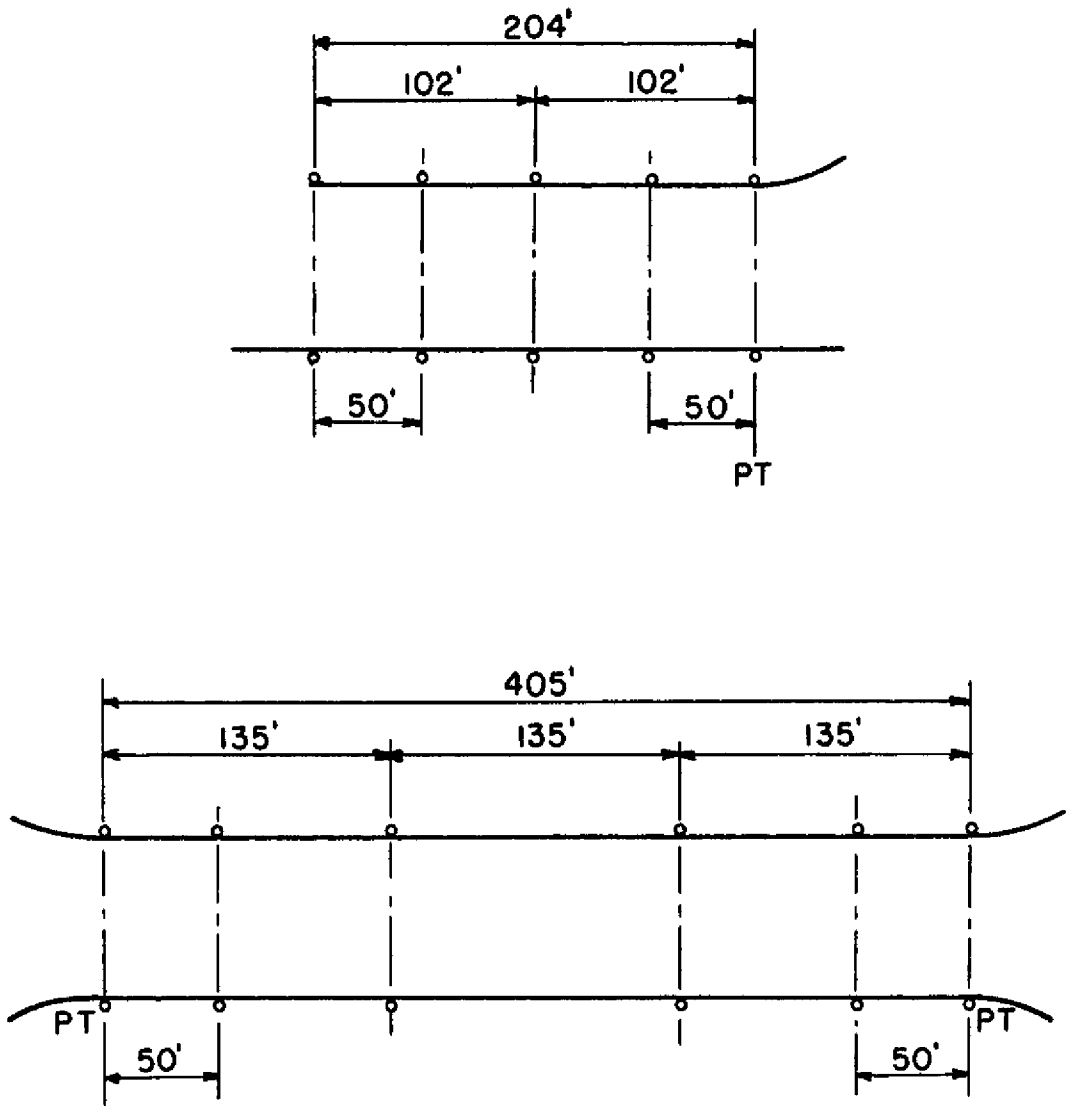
TYPICAL EXAMPLES STRAIGHT SECTIONS - MORE THAN 200 FEET
